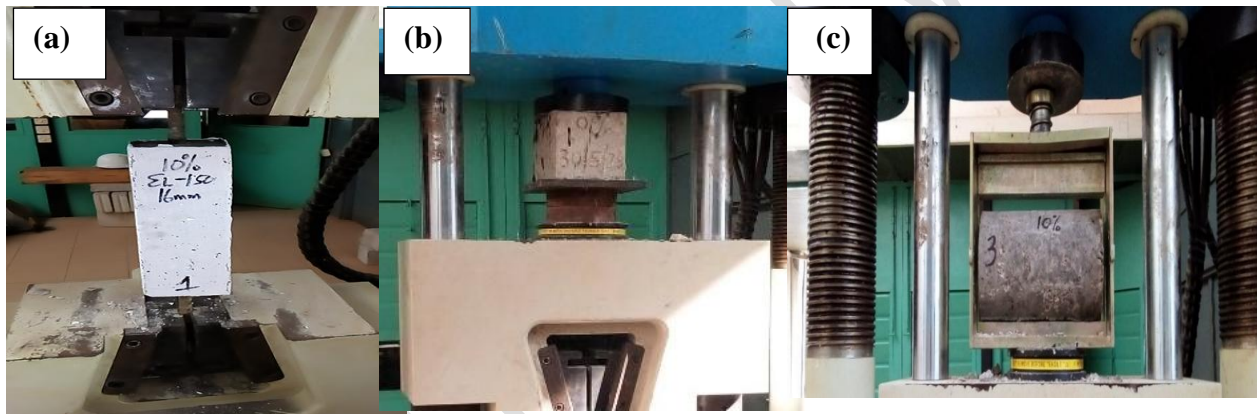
Testing of specimens using UTM: (a) Anchorage bond strength (double pull-out) test, (b) compressive strength test, (c) splitting tensile strength test.
